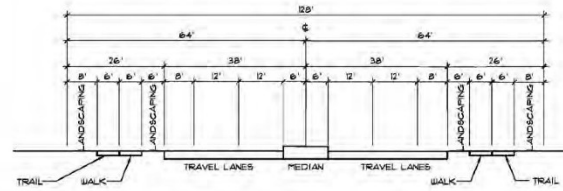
GVSP ROADWAY CROSS-SECTIONS
